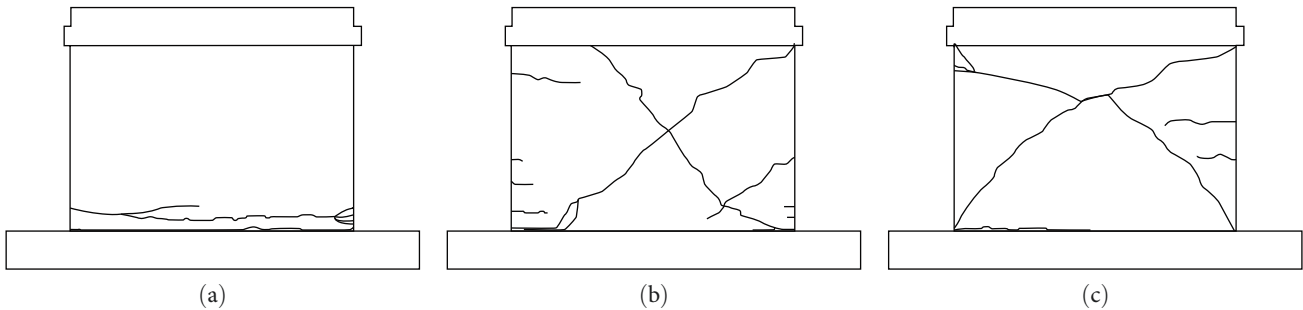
Photos of the crack distribution. (a) Unreinforced wall piece. (b) Wall piece with intelligent strand. (c) Wall piece without intelligent strand.
